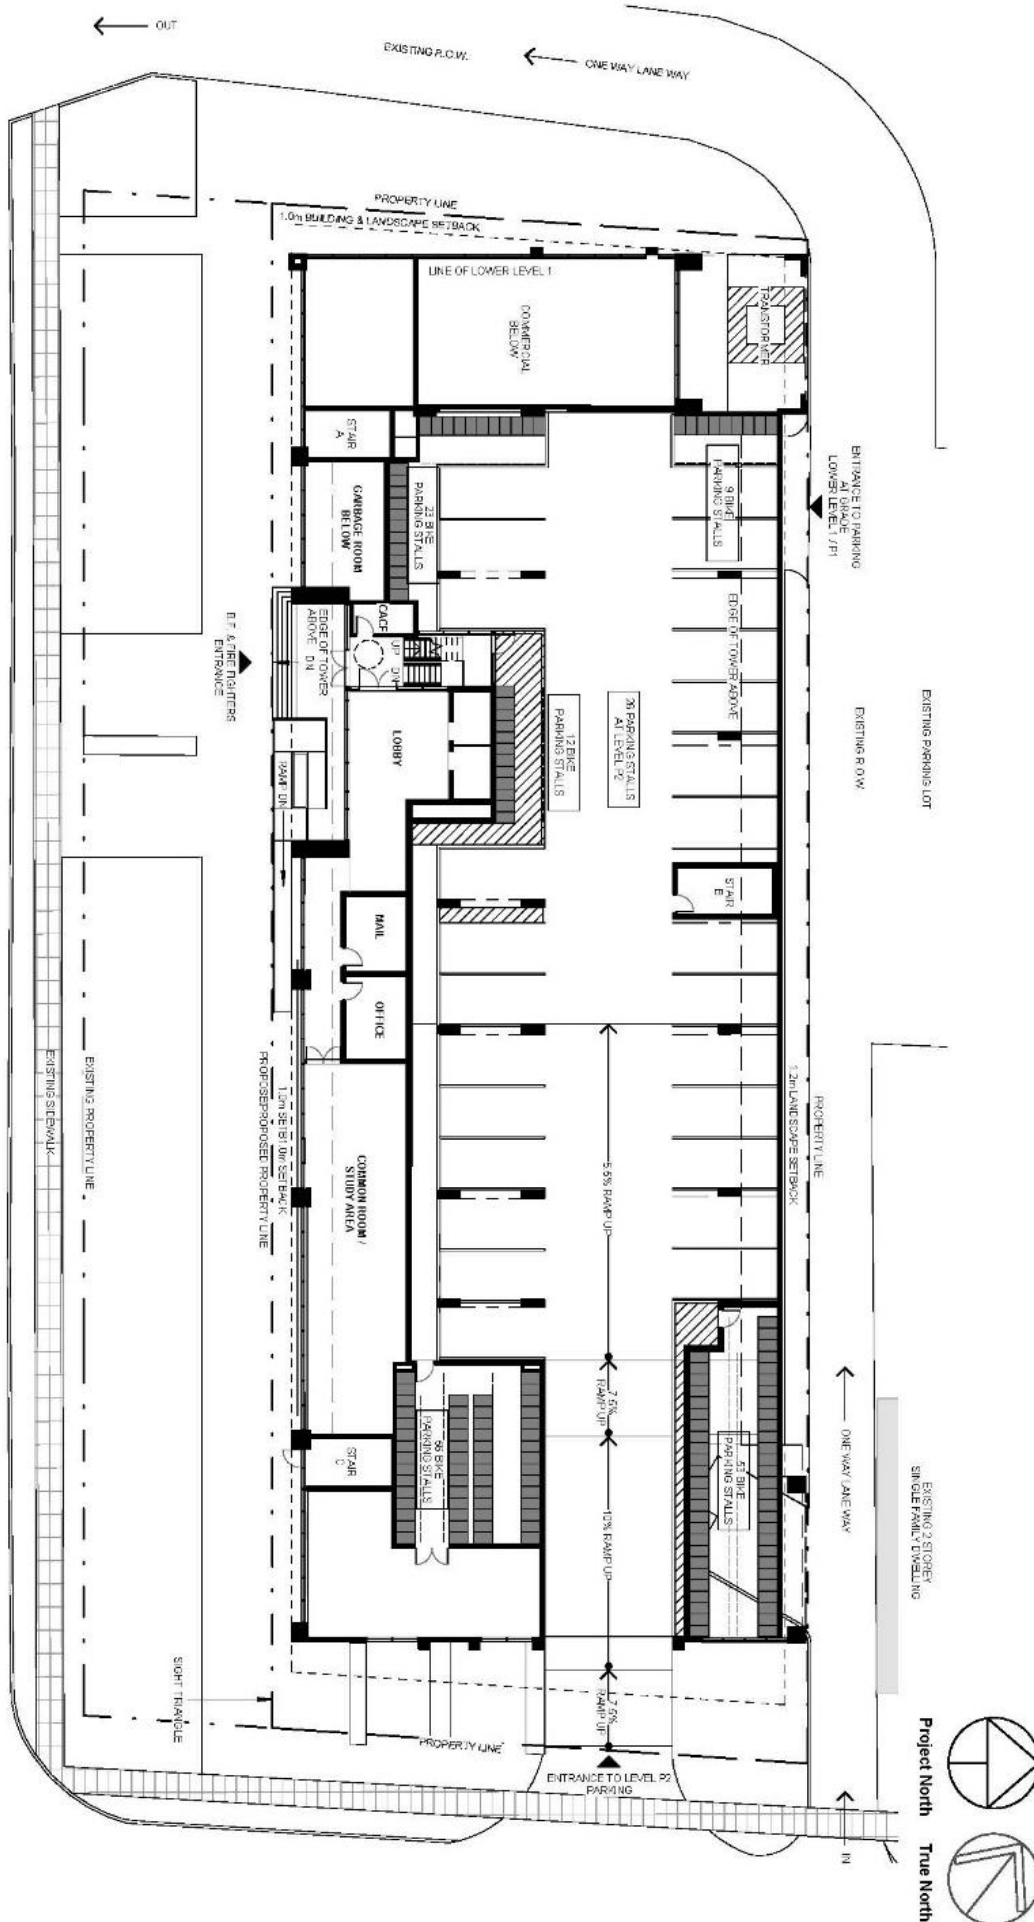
Illustration depicting the “upper” parking deck with access from Raymond Avenue to the south
